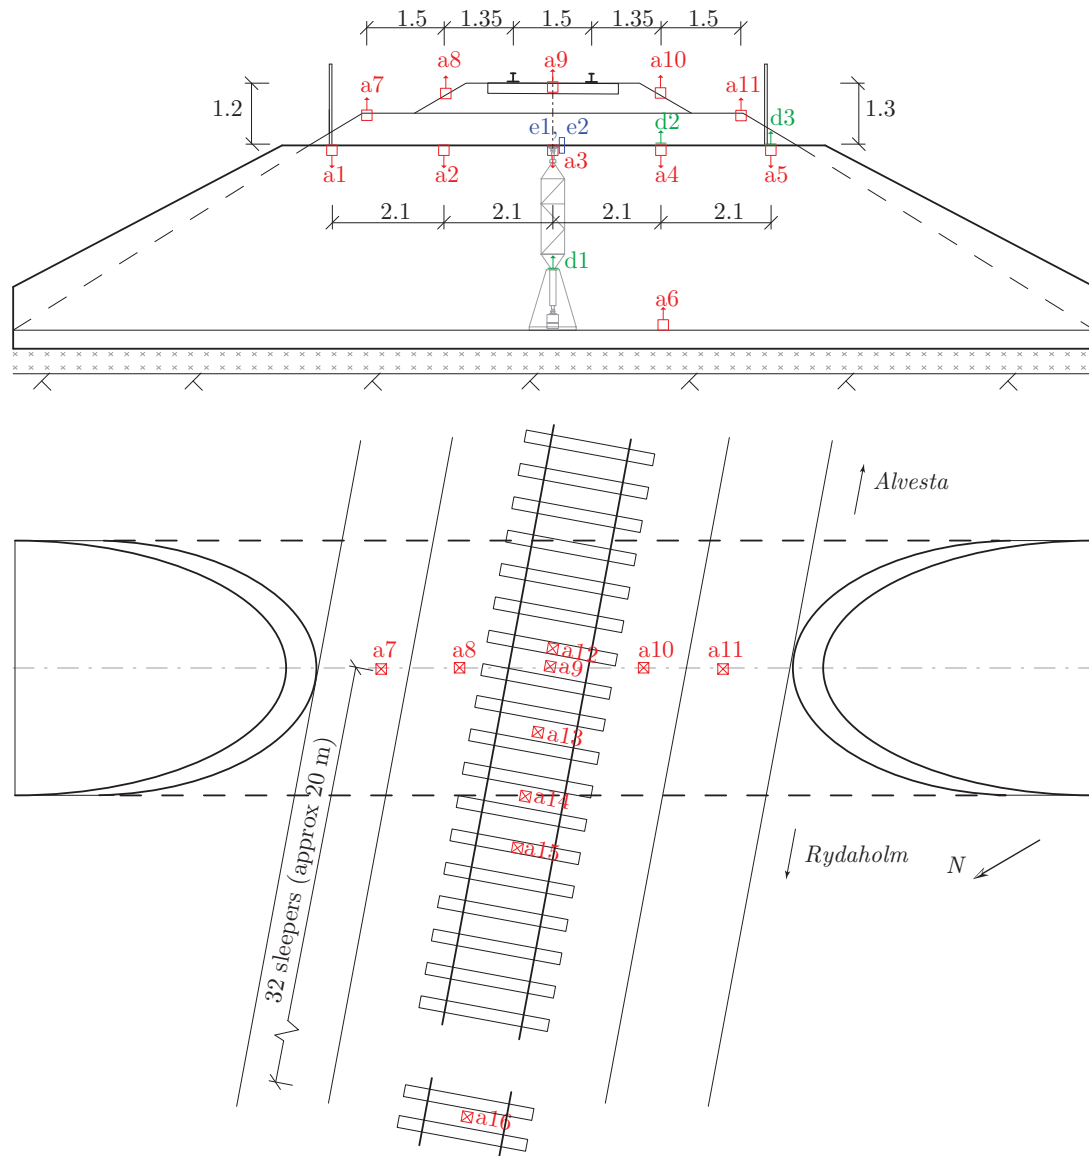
Instrumentation of the bridge at Hårestorp in 2018, plan and elevation.
